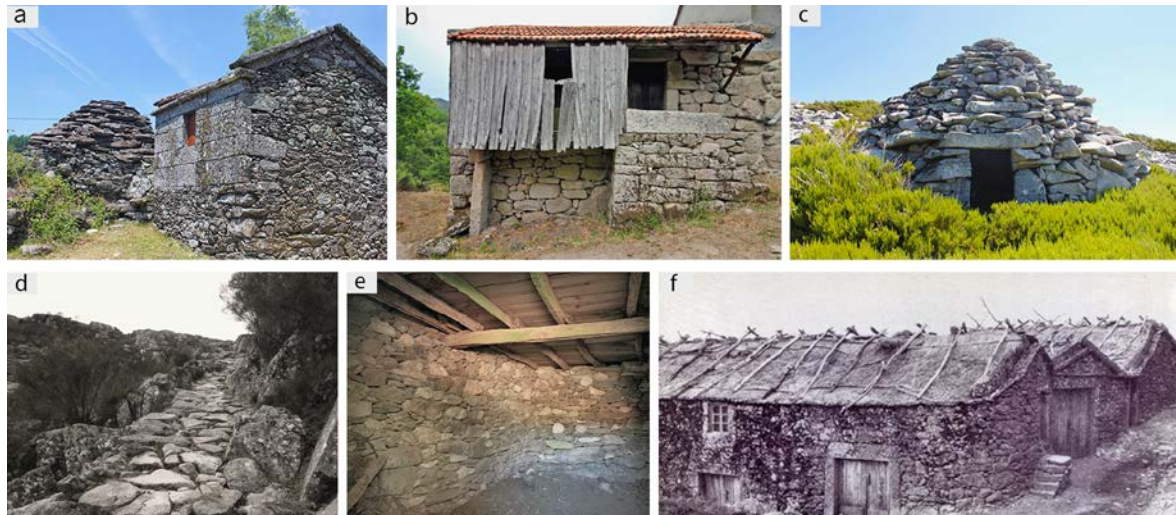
Examples of different materials and construction techniques: (a) rubble, ashlar and corbelled dome granite dry stack masonry; (b) timber wall and balcony; (c) shelter in corbelled dome dry stack granite masonry; (d) granite pavement on mountain range path; (e) wooden floor structure; (f) thatched roofs.
